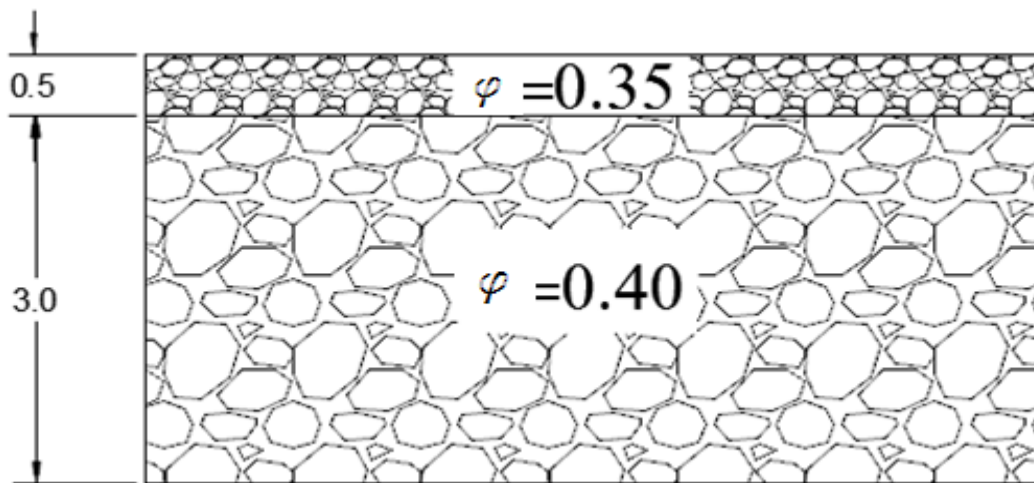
Typical porous pavement cross-section with dimensions in feet and the porosity of each section, ϕ .
